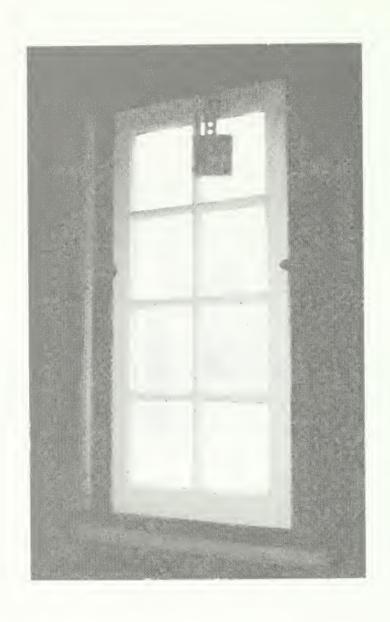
Second-story kitchen hall (Room 206), west wall, window W210.
